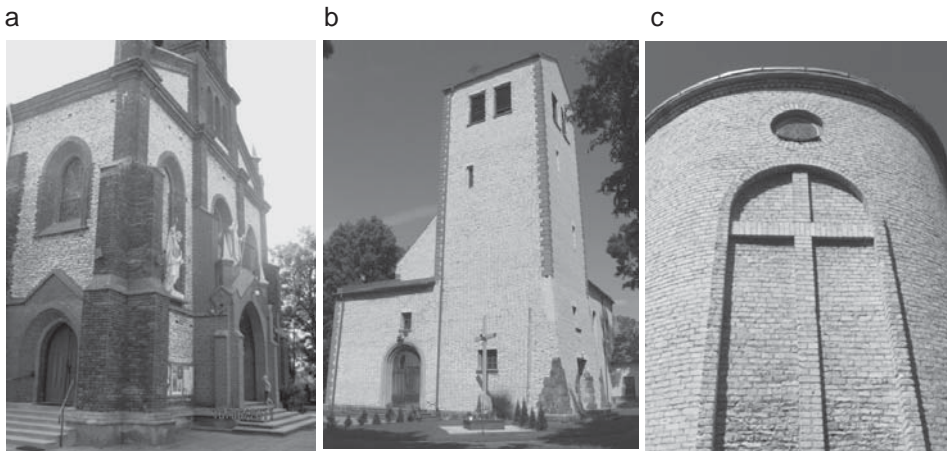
Typical farm buildings constructed in brick technology using local stone from: a – Plebanski, b, c – Sobótka nad Nerem
